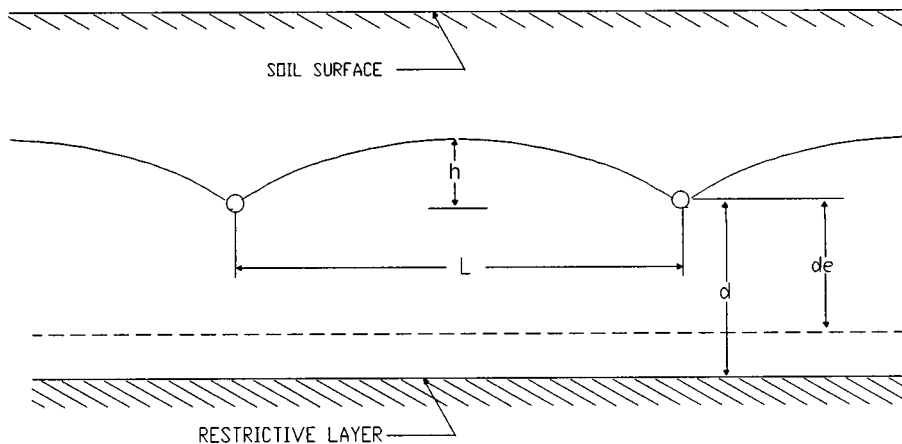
Typical cross section of pipe drain system laterals defining Hooghoudt equation variables
